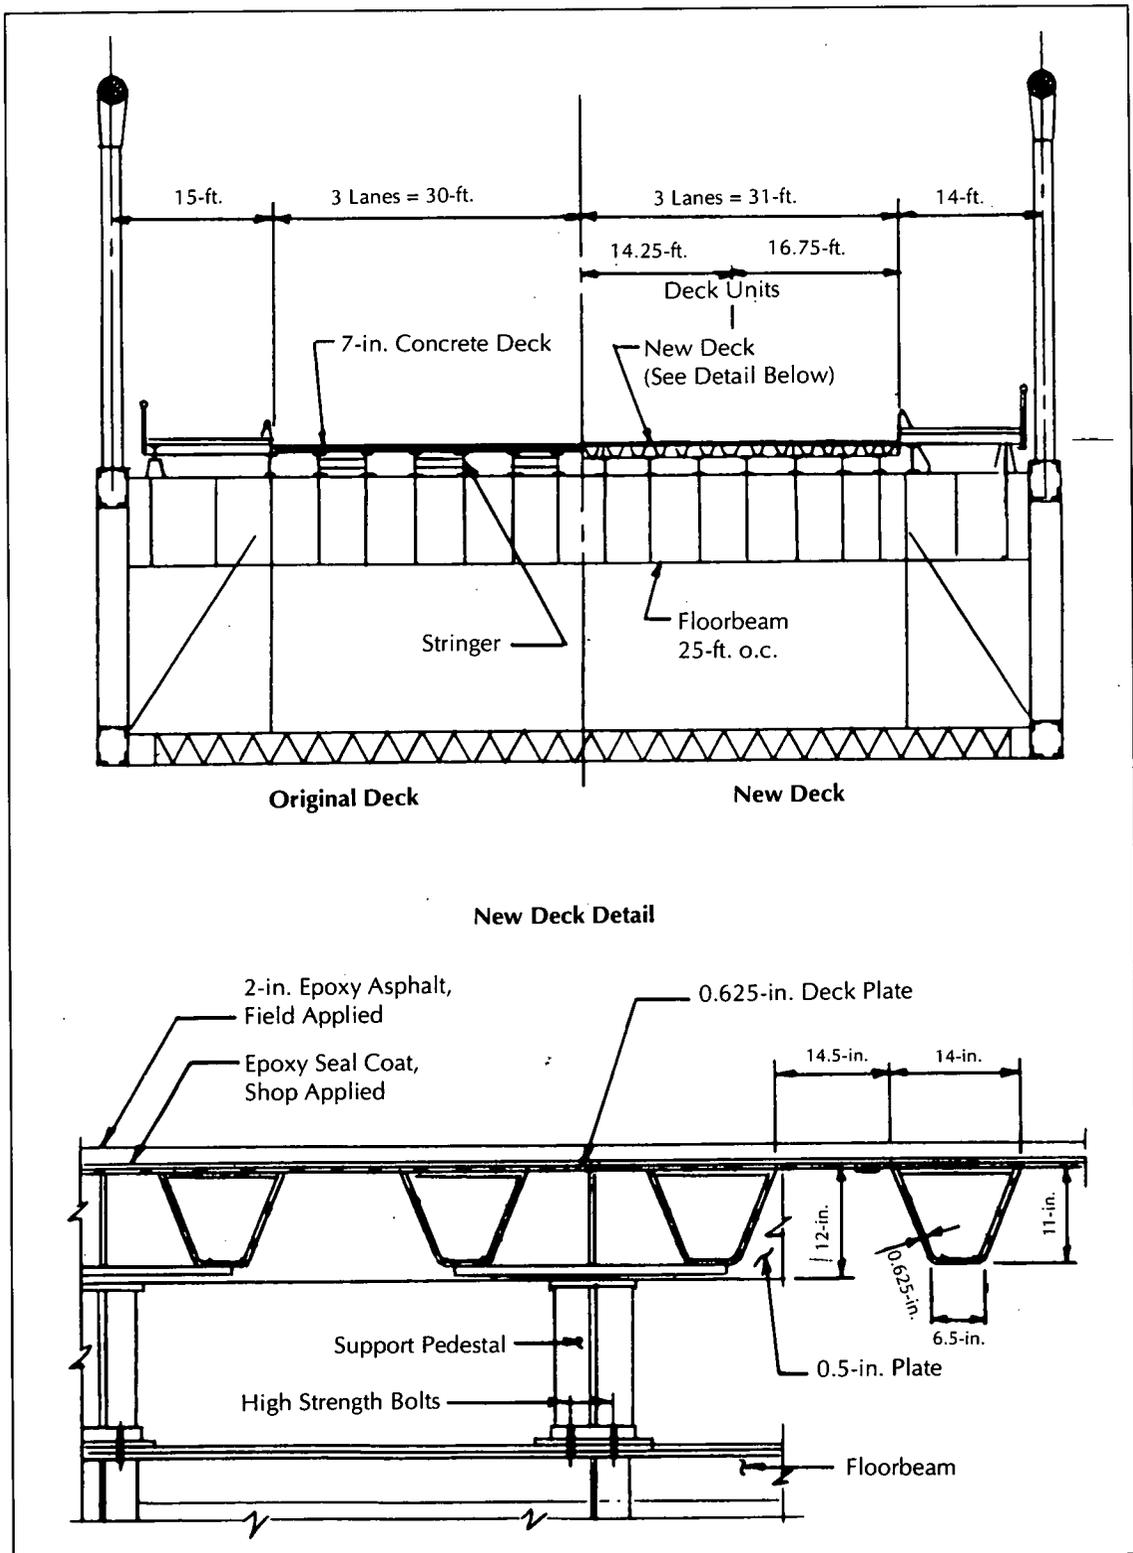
The orthotropic steel deck for the Golden Gate Bridge.
